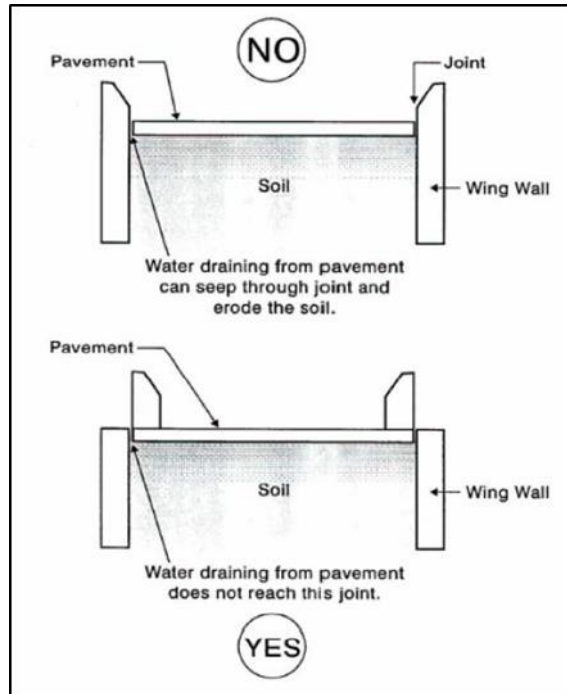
Cross Section of a Wingwall and Drainage System (Briaud et al. 1997)
